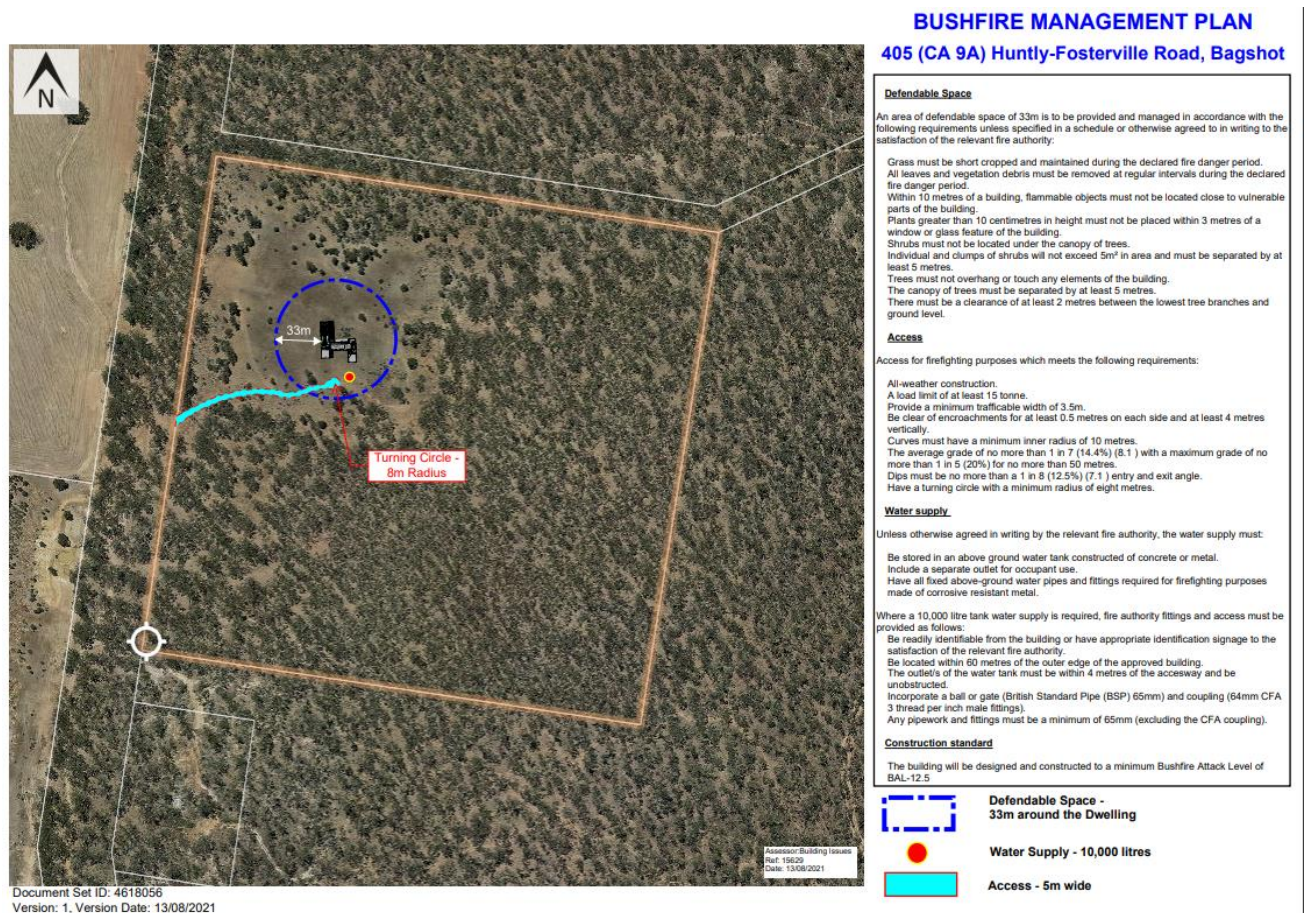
Elevation PlansFigure 4: Bushfire Management Plan
